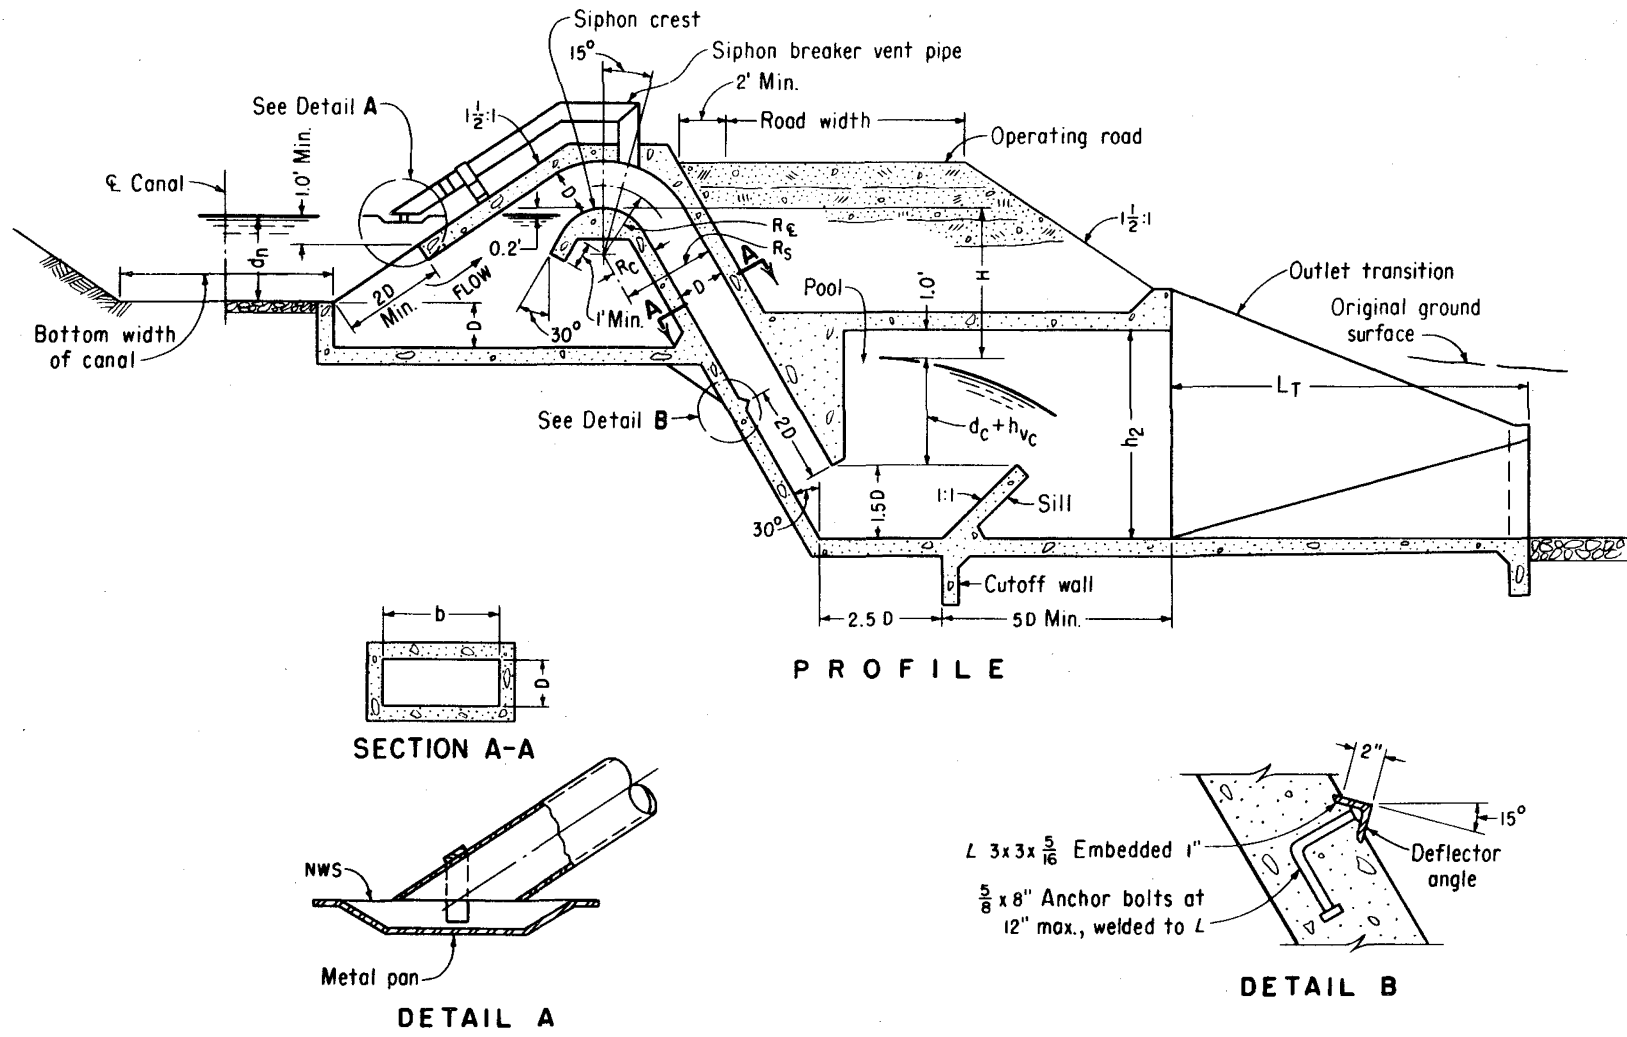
Siphon spillway—typical sections. 103-D-1302
